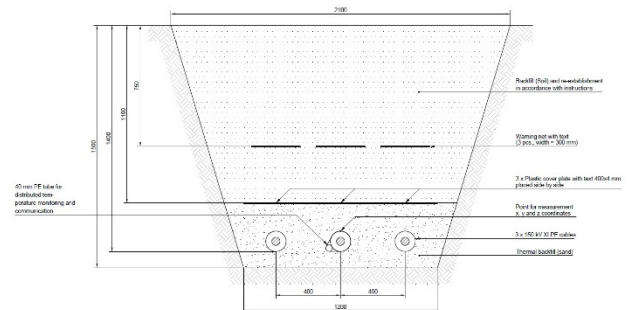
Cross sectional sketch of a trench for installing cables in rural areas in the Danish transmission grid
